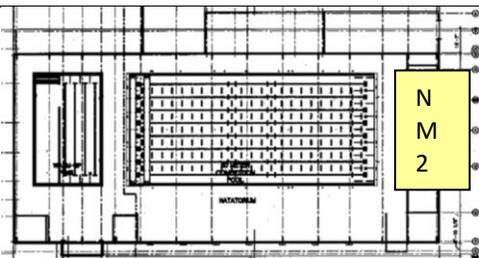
Natatorium 2nd Floor Mechanical Room Location
